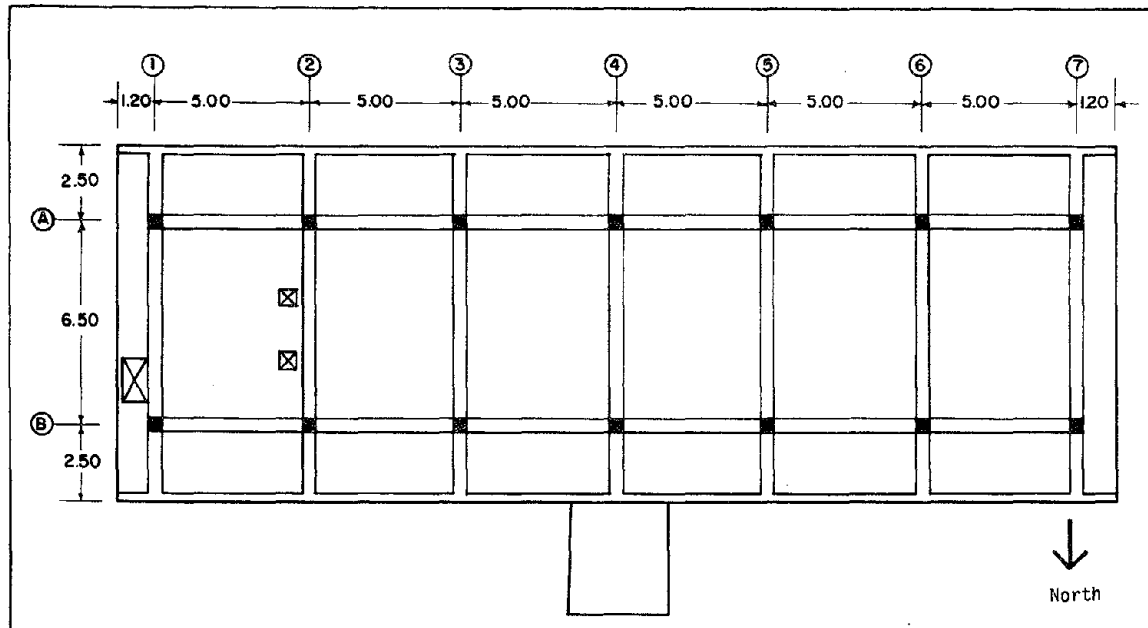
STRUCTURAL PLAN OF THE ESCUELA DE NIÑERAS
